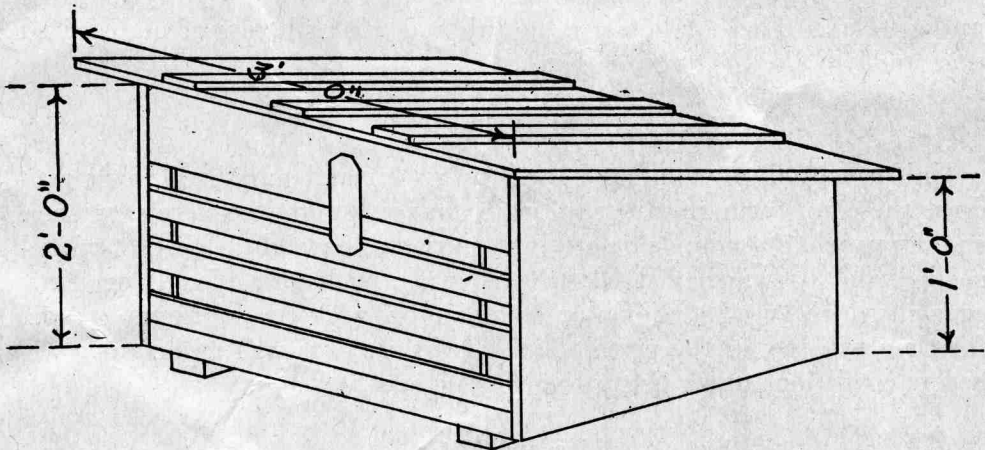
Home-made Brood Coop.* Dimensions: Made from large box, floor space to be about 3 ft. by 3 ft. Knock bottom out of box and saw boards so they will fit inside; then nail two pieces of studding crosswise on floor to raise same from ground. Knock off top of box and saw through box to give proper slope for roof. Knock out front of box and make slat door.
